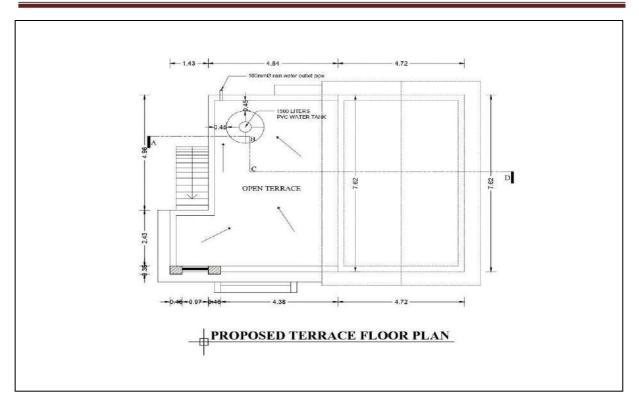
AnganwadiTrerrace Floor Plan
